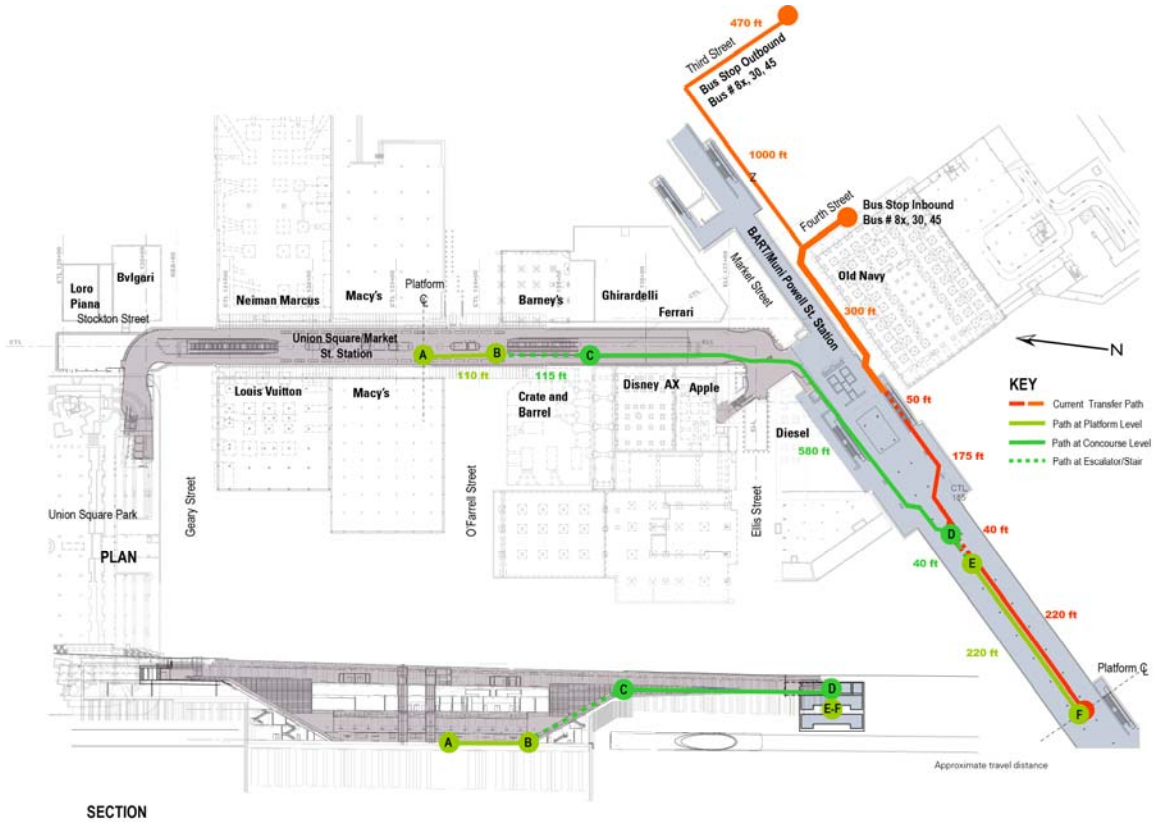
Central Subway Union Square/Market Street Station Connection to Powell Street Station
